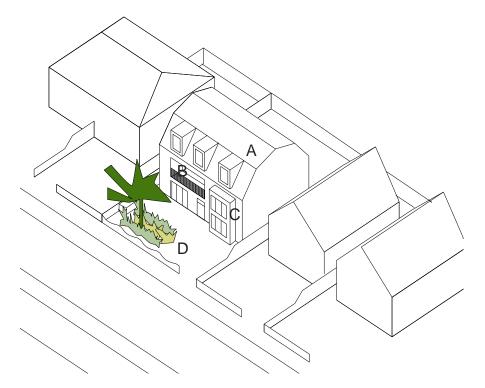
Diagram showing development parameters for new detached seafront homes A Pitched roof forms can reduce the visual impact of 3 storey new buildings adjacent to 2-storey existing buildings.
